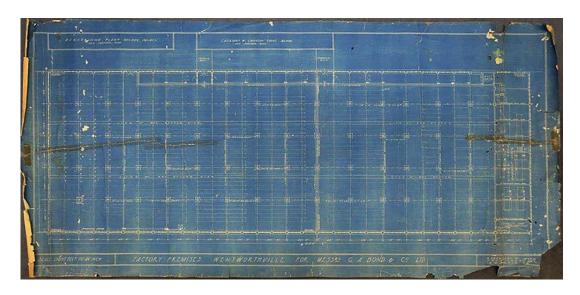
Plan of the Cutting Room by Robertson and Marks, Architects. (Source: Pacific Brands plan room)
